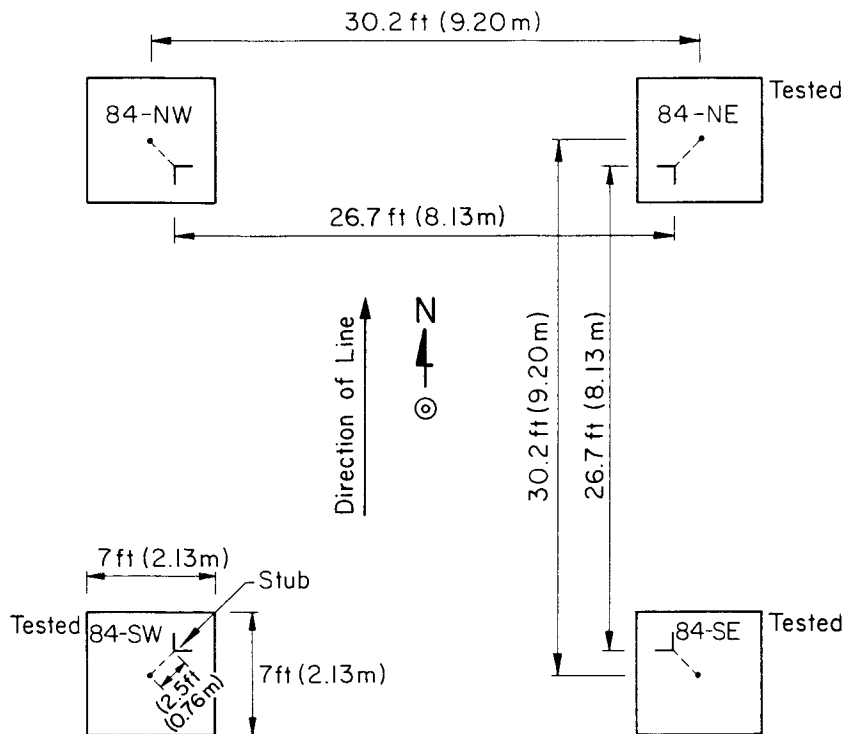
Plan View of Hickling Station No. 84 (Lehigh) Grillages
